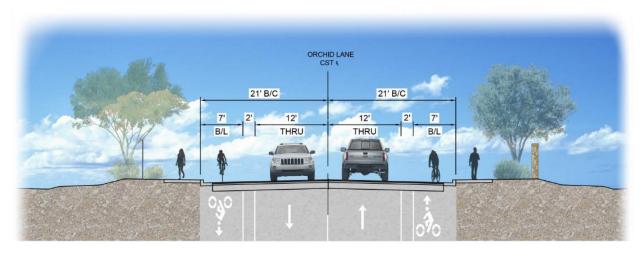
Orchid Lane Typical Section - Segment H3 Separated Bike Lanes/No Parking
